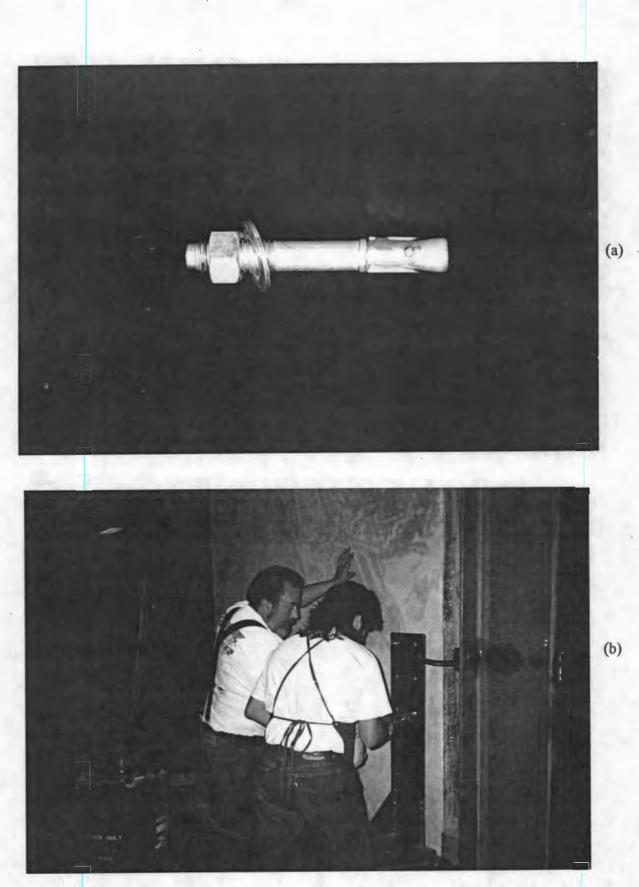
(a) Hilti Kwik Anchor Bolt, (b) Bolt installation at the bottom support
